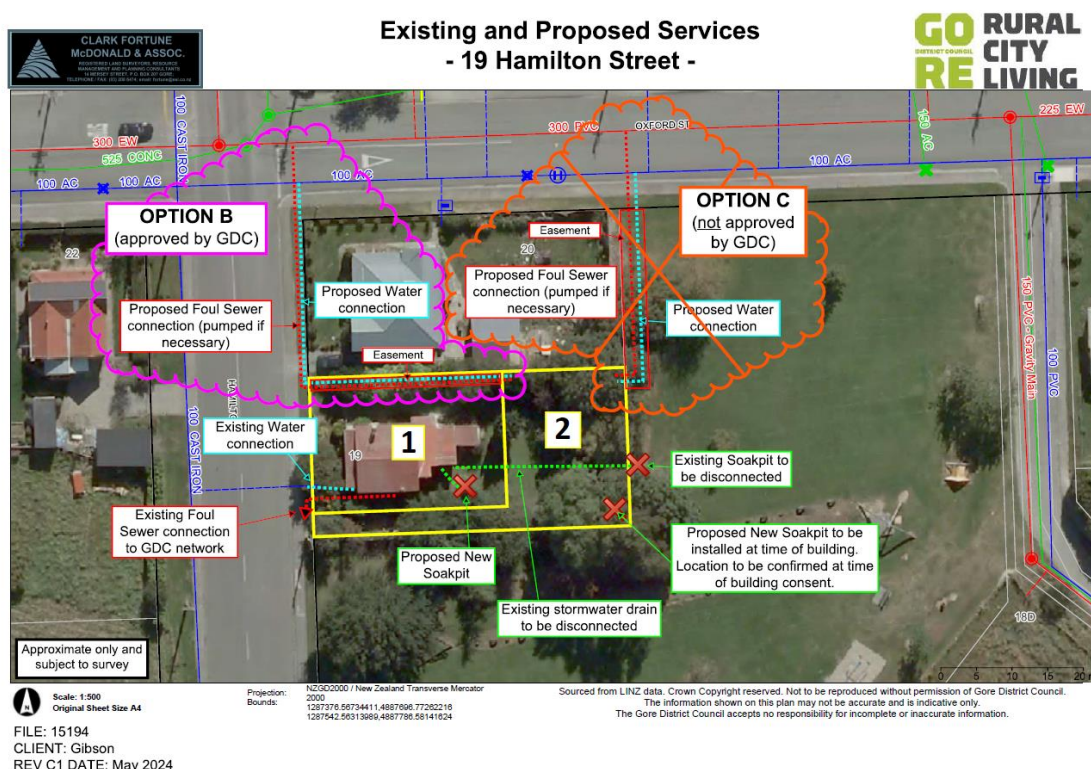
Services Scheme Plan outlining Option B for 19 Hamilton Street.
